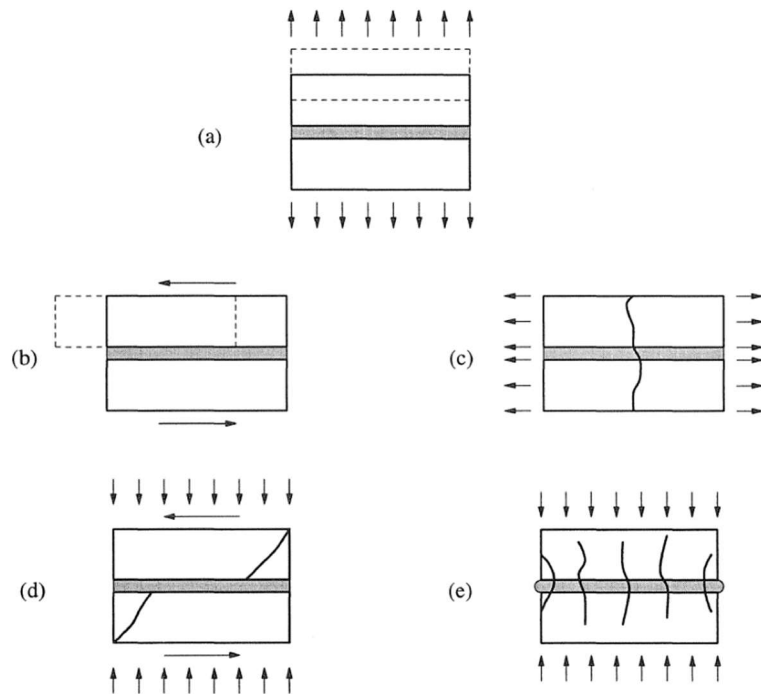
Masonry failure mechanisms: (a) Joint tension cracking; (b) joint slipping; (c) unit direct tension cracking; (d) unit diagonal tension cracking; (e) masonry crushing (P. Lourenço et al., 1995)
